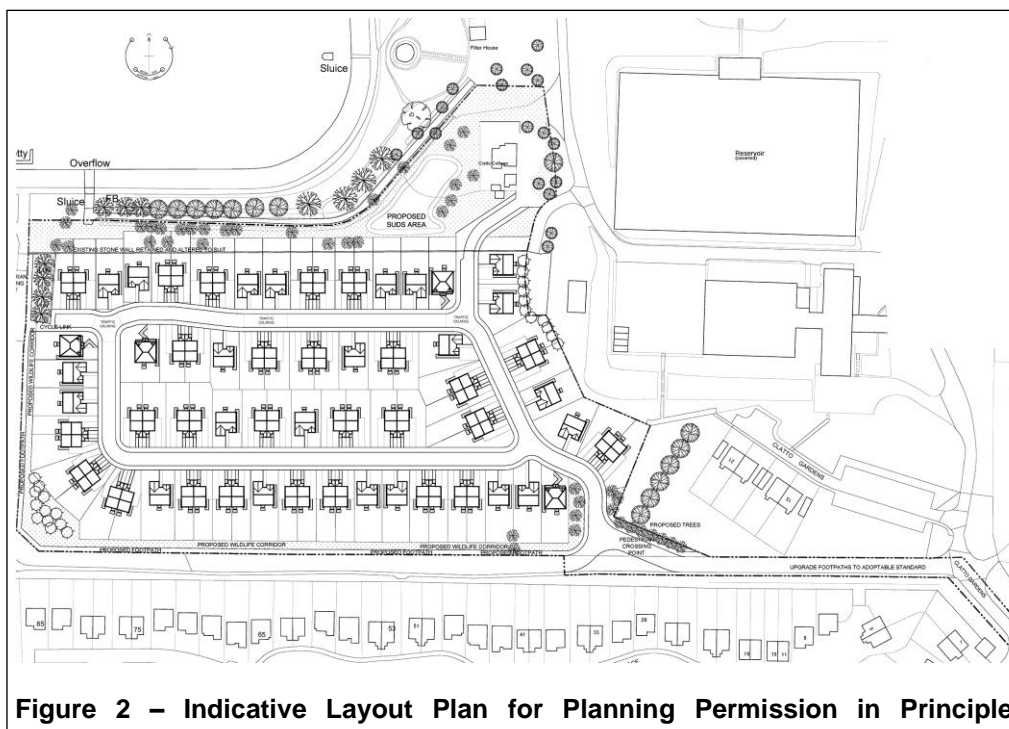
Indicative Layout Plan for Planning Permission in Principle
